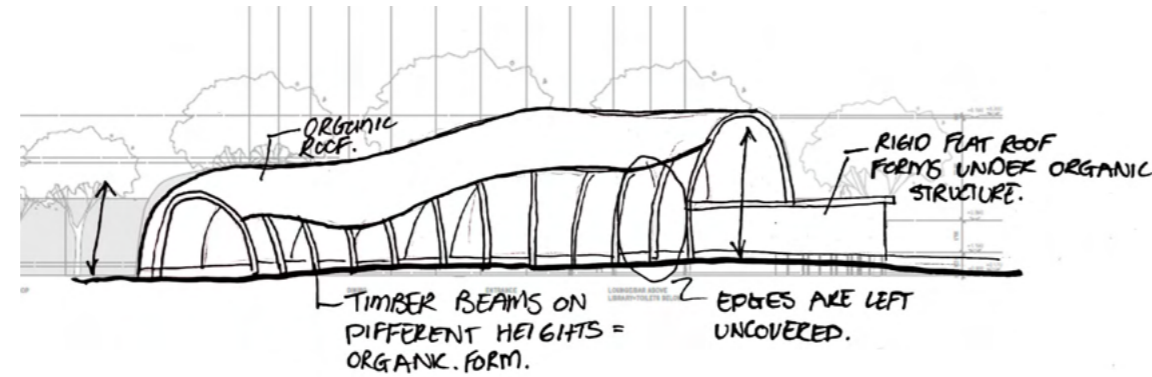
Elevation analysis Adapted by author: (Archdaily,2020: online)
